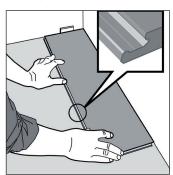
First plank, first row Place a distance ca 10mm thickness to the left and position against the wall.
